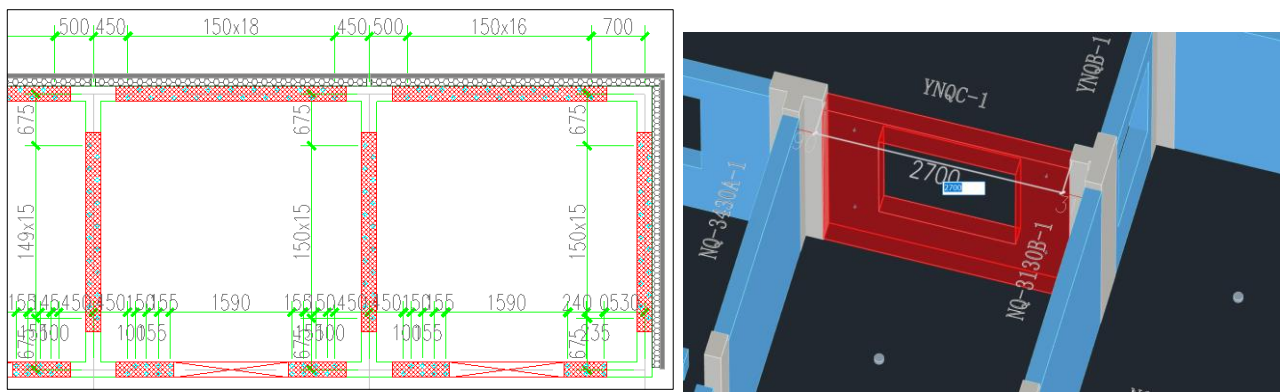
Subdivision scheme for prefabricated walls of 15G365-1 and 15G365-2 in YJK's built-in prefabricated building design software
